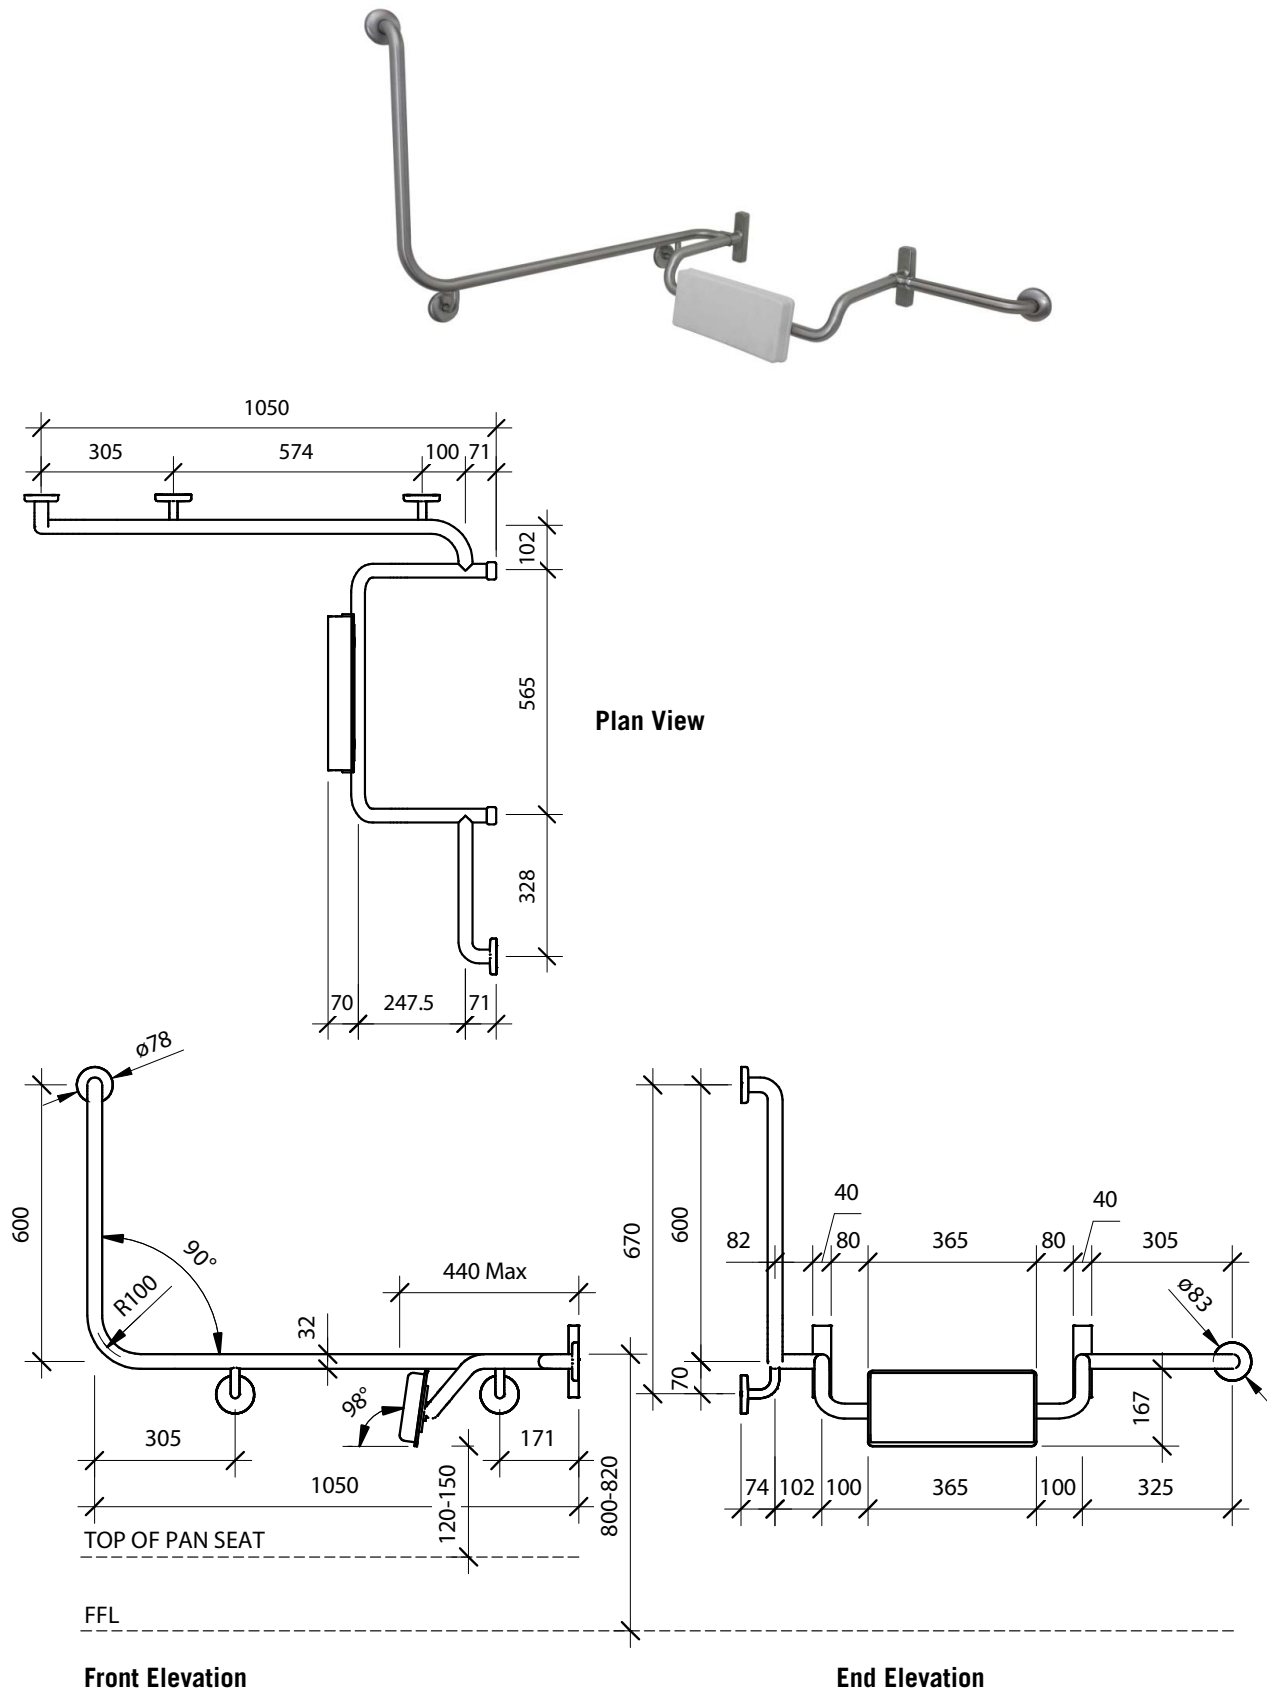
90° Right Hand 2 Wall grab Rail With Backrest
